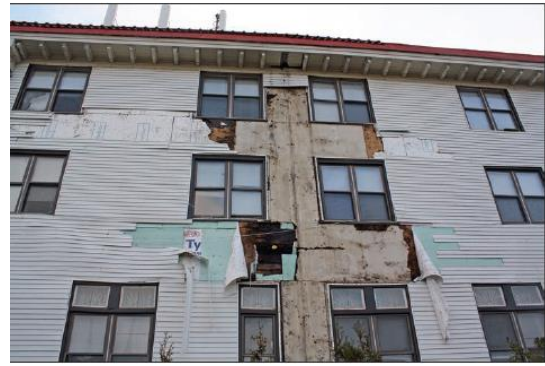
Siding loss and minor envelope damage on low-rise building from a wind event [Source: FEMA]
